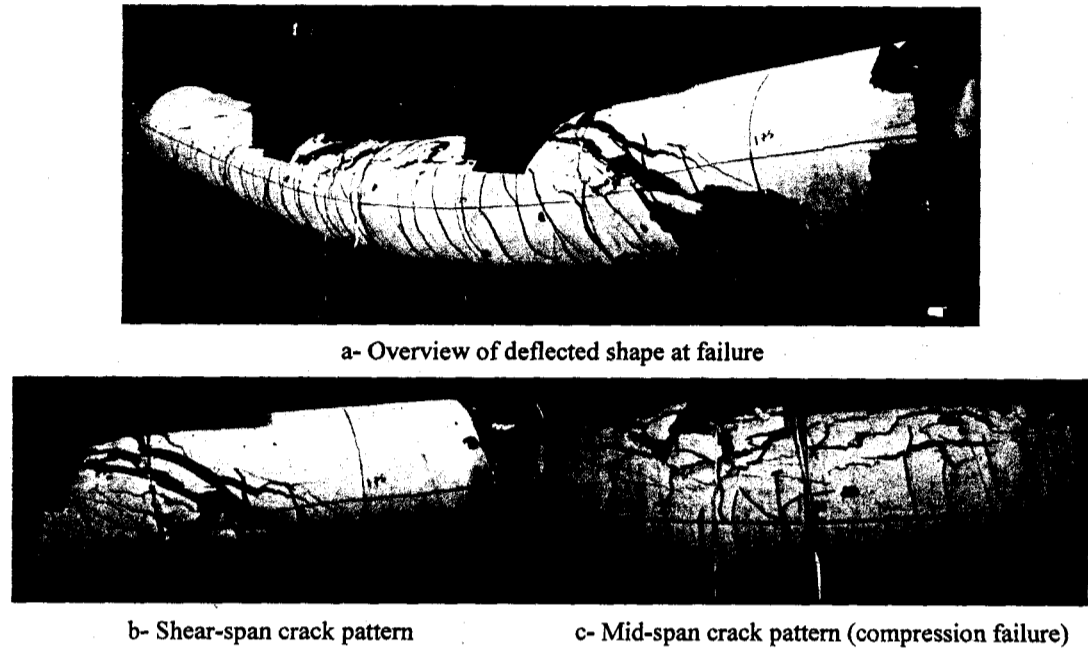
Failure mode and concrete crack pattern of RC beam COS-S-N
